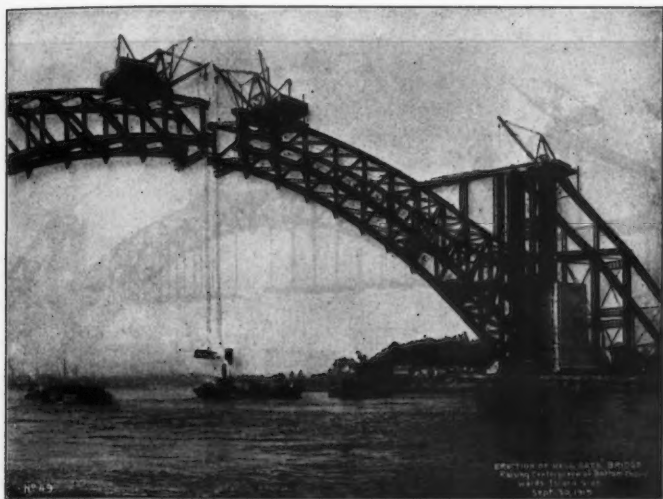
ERECTION STAGE, SEPTEMBER 30TH, 1915. RAISING CENTER PIECE OF BOTTOM CHORD, HELL GATE BRIDGE.
